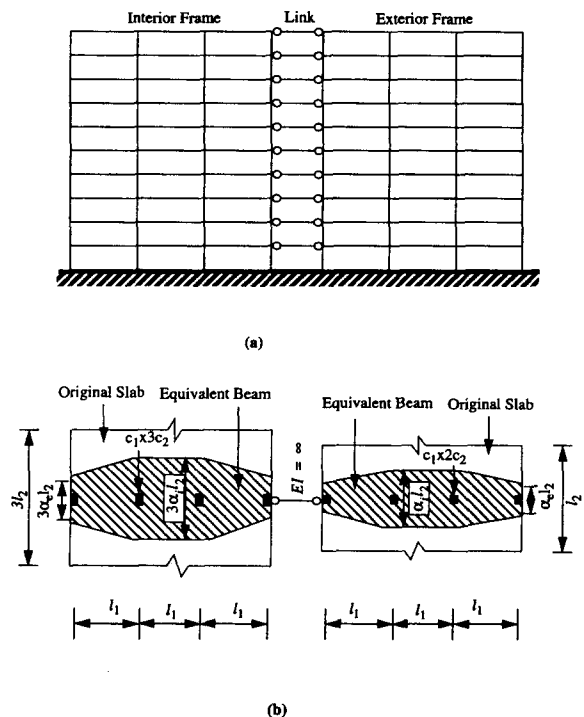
Analysis Model of Flat-Slab Buildings: (a) Elevation; (b) Plan
